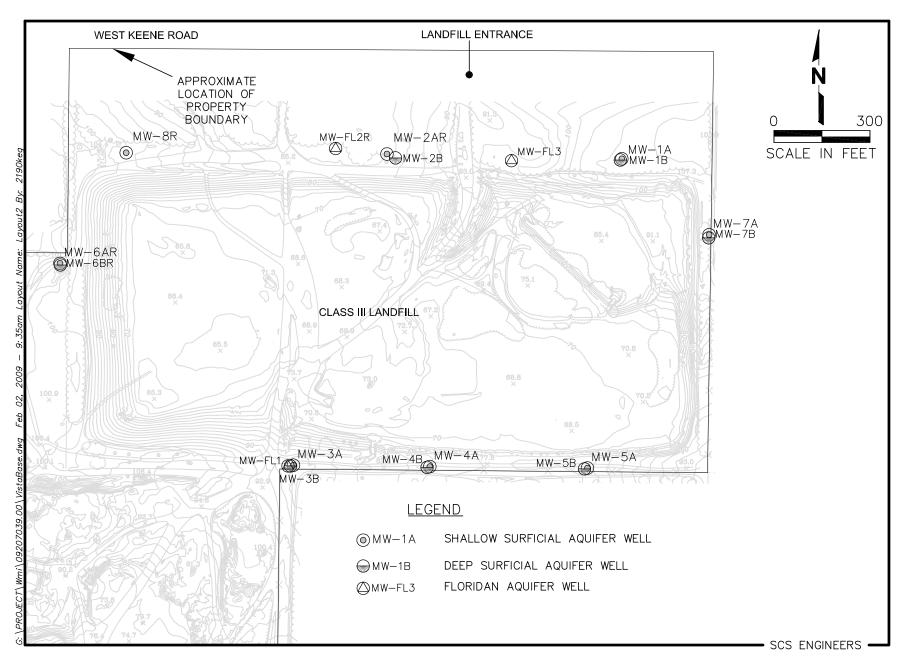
Site Map, Vista Landfill, Apopka, Florida.
